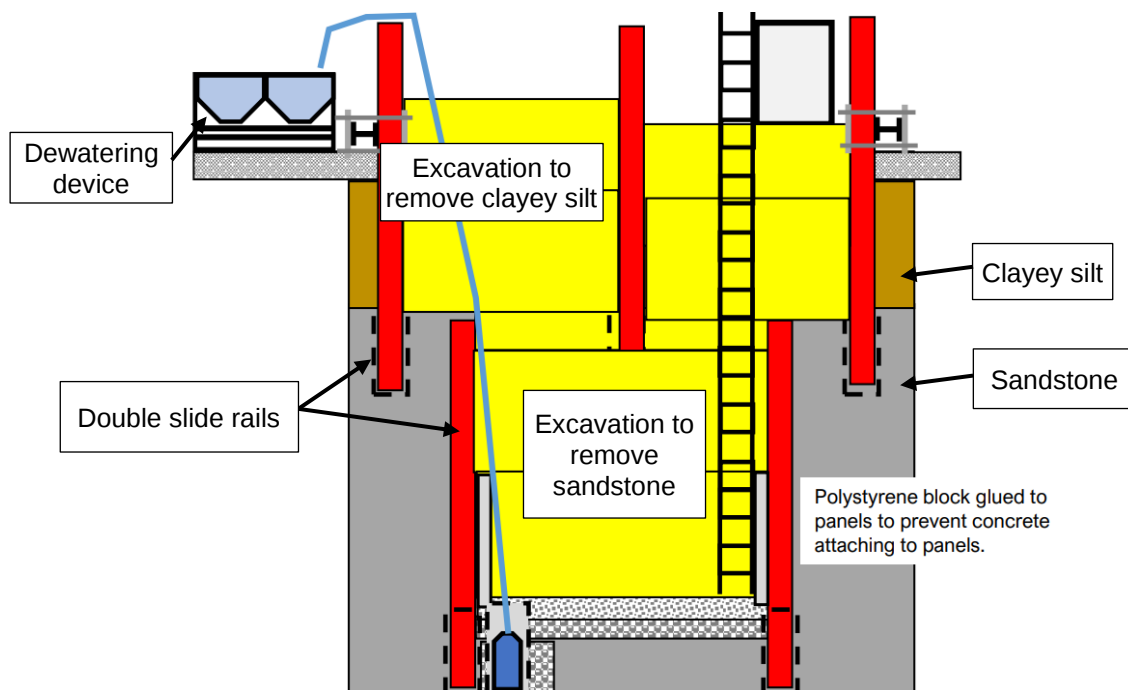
Staged excavations to install pump station inlet manhole and wet well components
